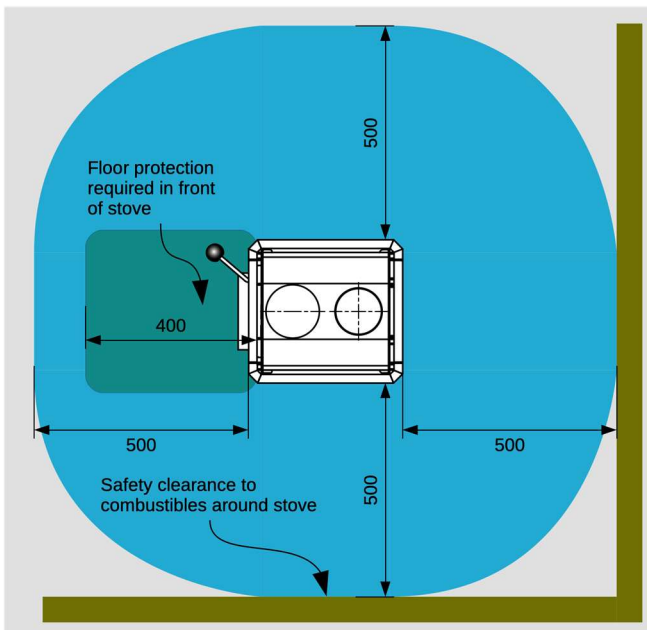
Parra 6 Sauna Stove clearance to combustible materials
